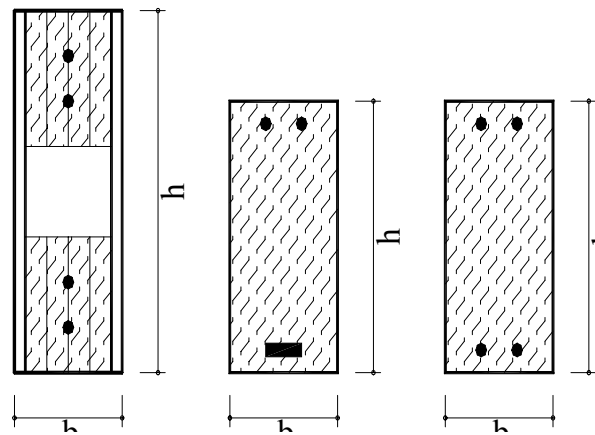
Cross-section of Wooden Beams with Reinforcement.
